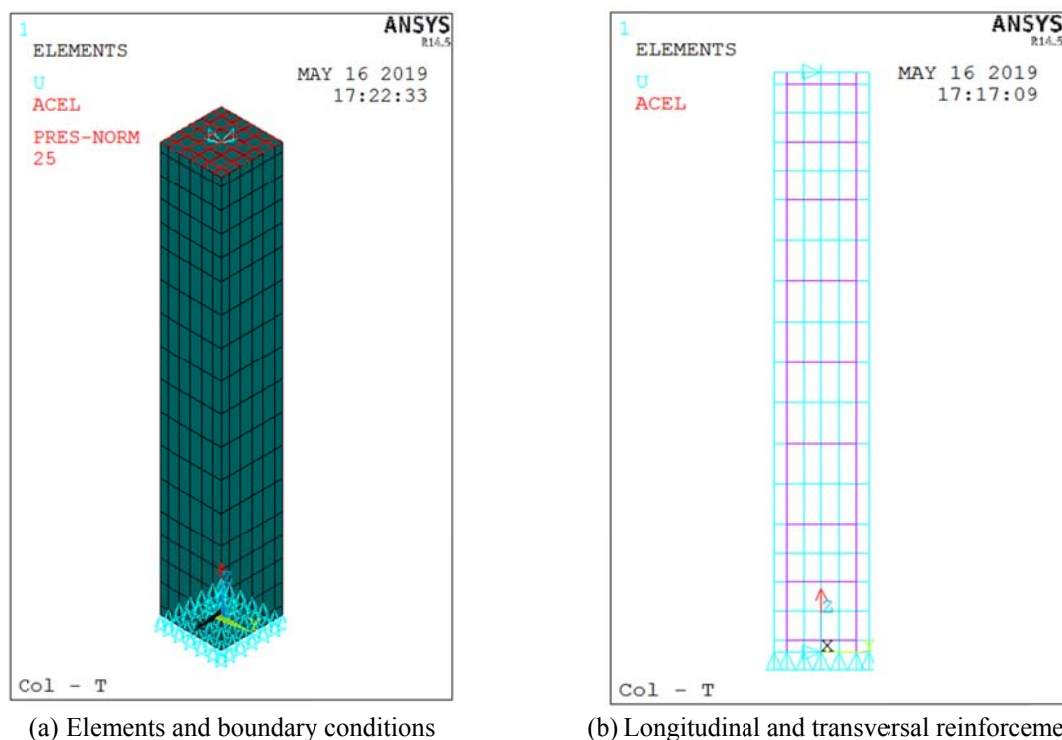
Column model including concrete elements, reinforcement, boundary conditions and, applied surface pressure.
